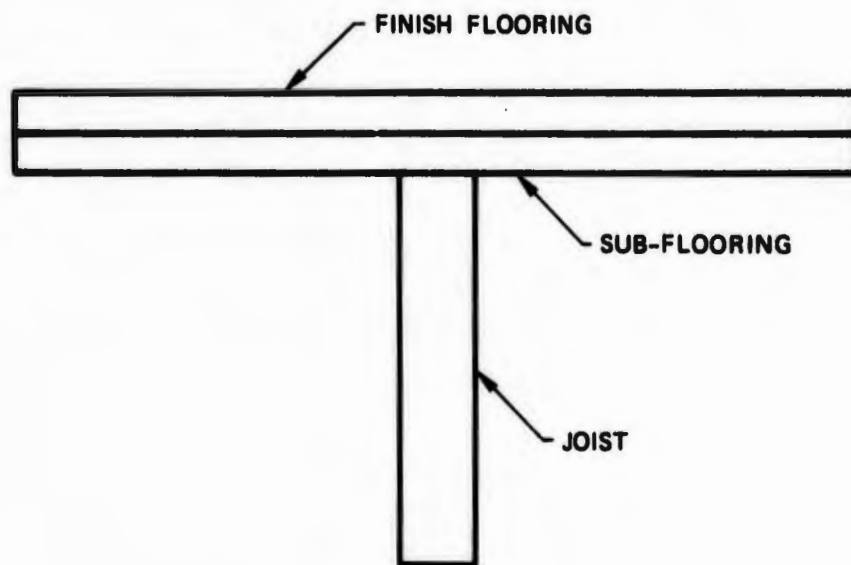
CROSS SECTION OF TYPICAL WOOD-JOIST FLOOR SYSTEM
